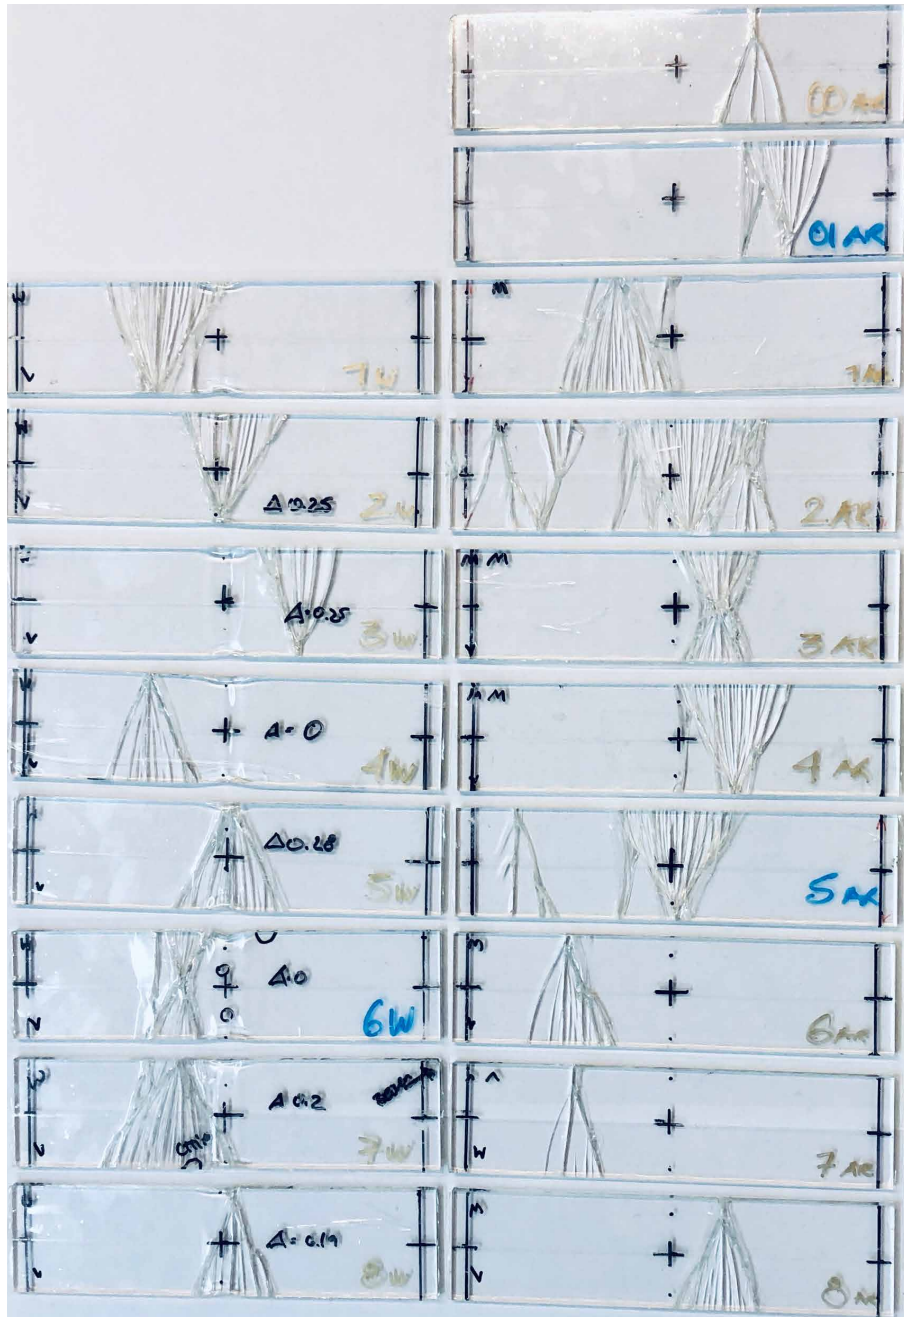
Specimens after 4 point bending test. Left side heat bonded specimens (HB), right side as received (AR)
